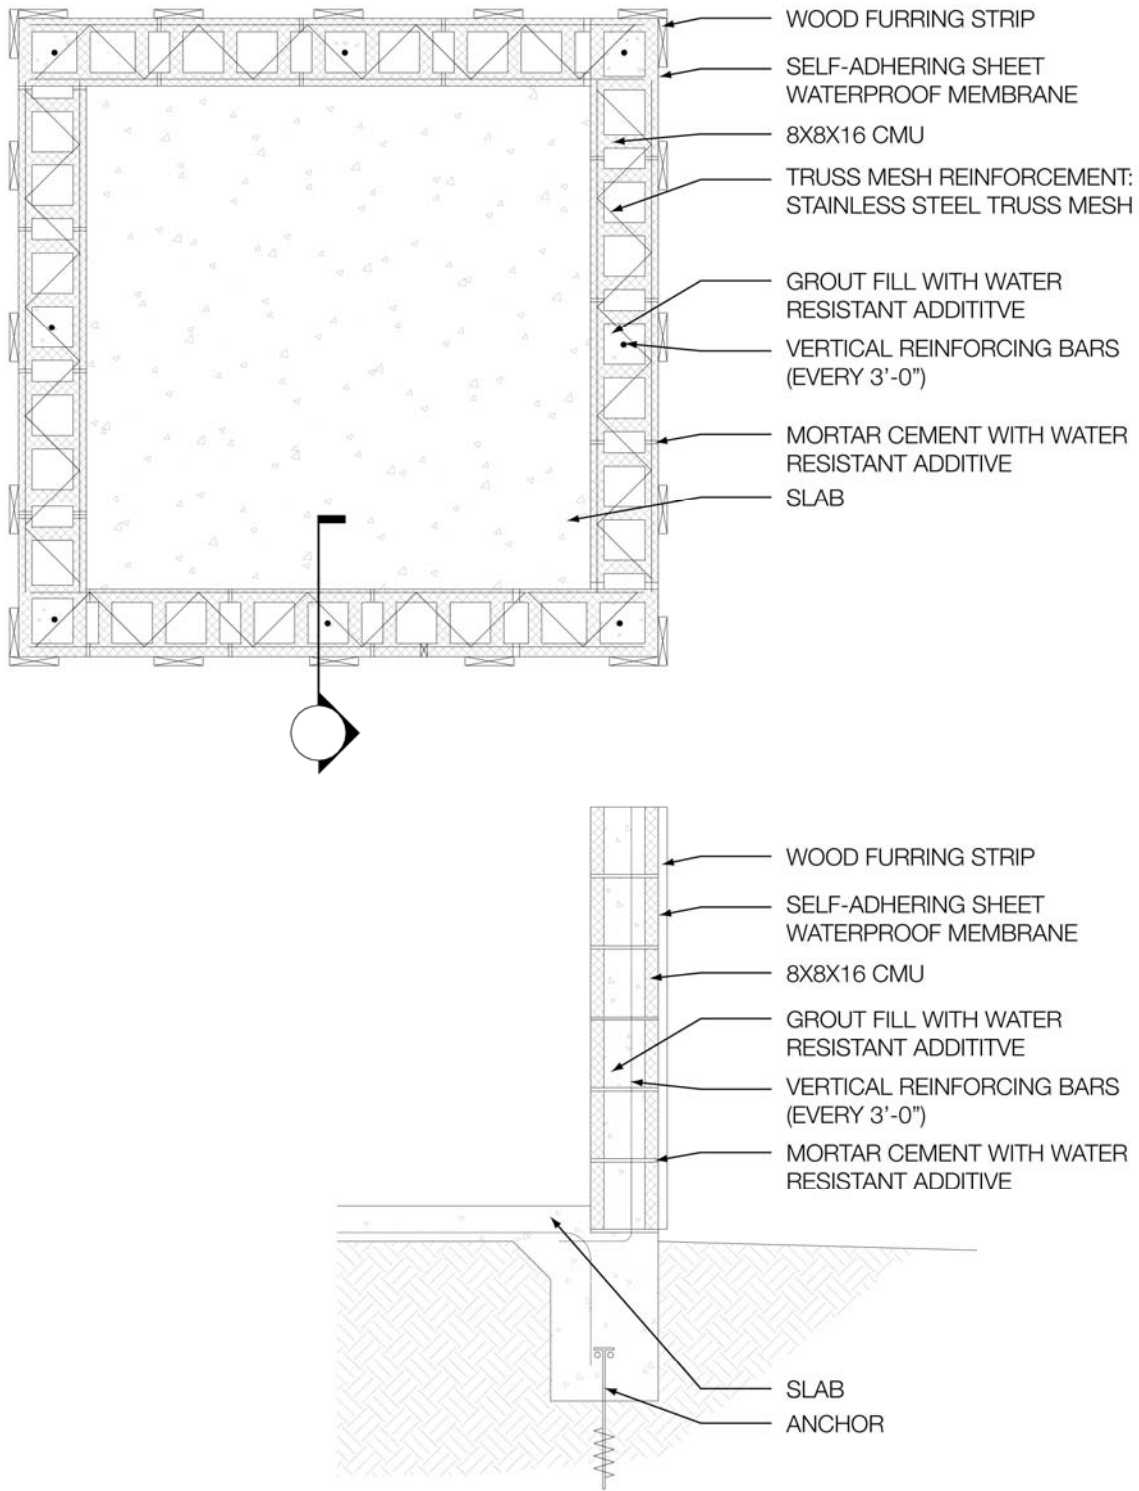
DIAGRAM: Detailed Drawings, test pod G: sheet membrane block.
